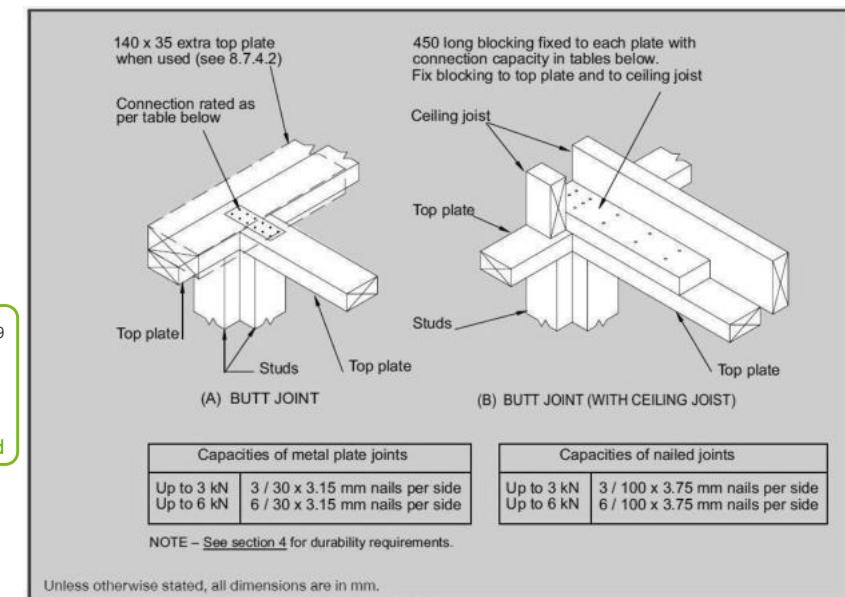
Connecting top plates to external walls at right angles – Walls containing bracing (see 8.7.3.4)
